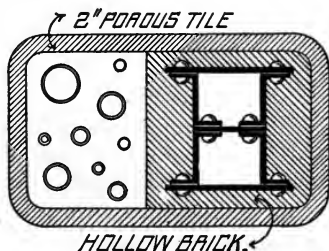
Method of Fireproofing Columns, Monadnock Building.
